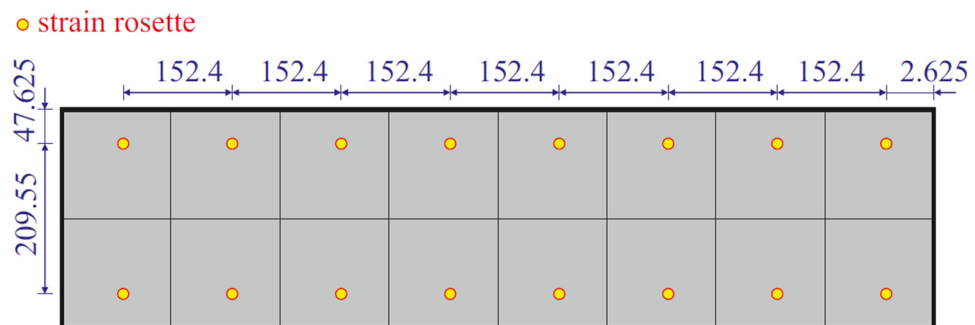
Short cantilever beam discretized using 16 iQS4 elements and exact locations [mm] of strain rosettes.
